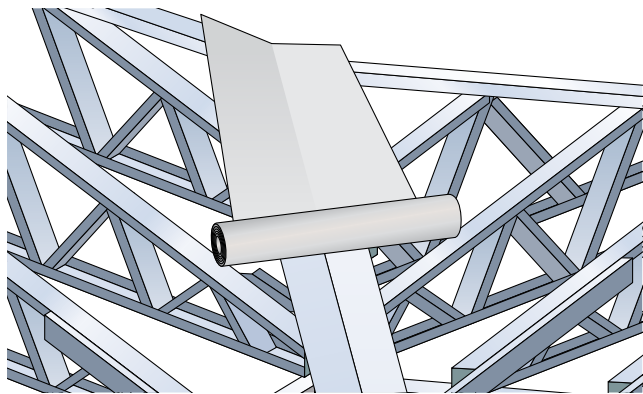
Installing the underlay from the top valley, note approach is from a fully battened section of roof
